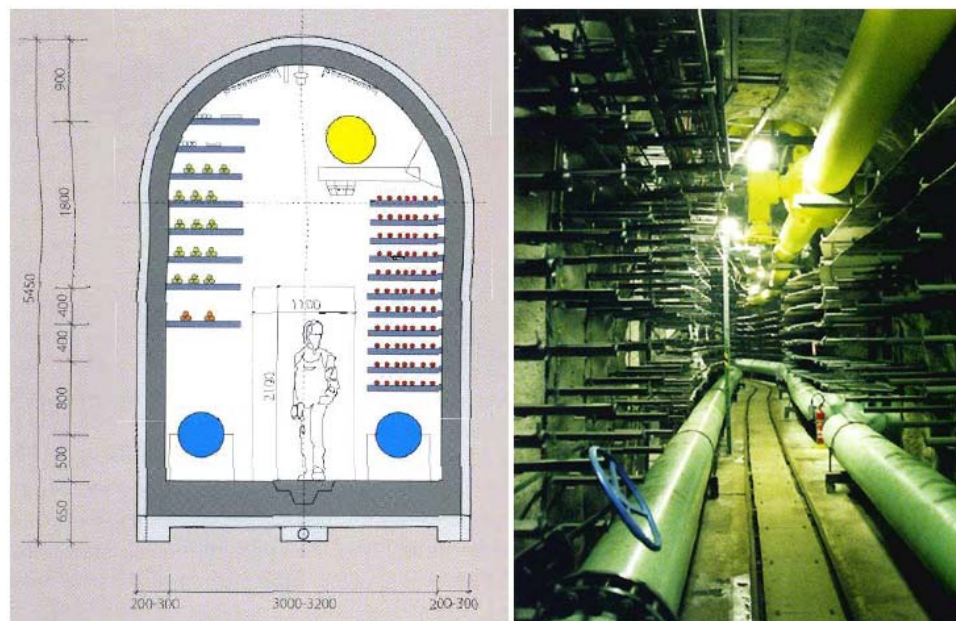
Detailed Design and Tunnel after the Construction in Prague
